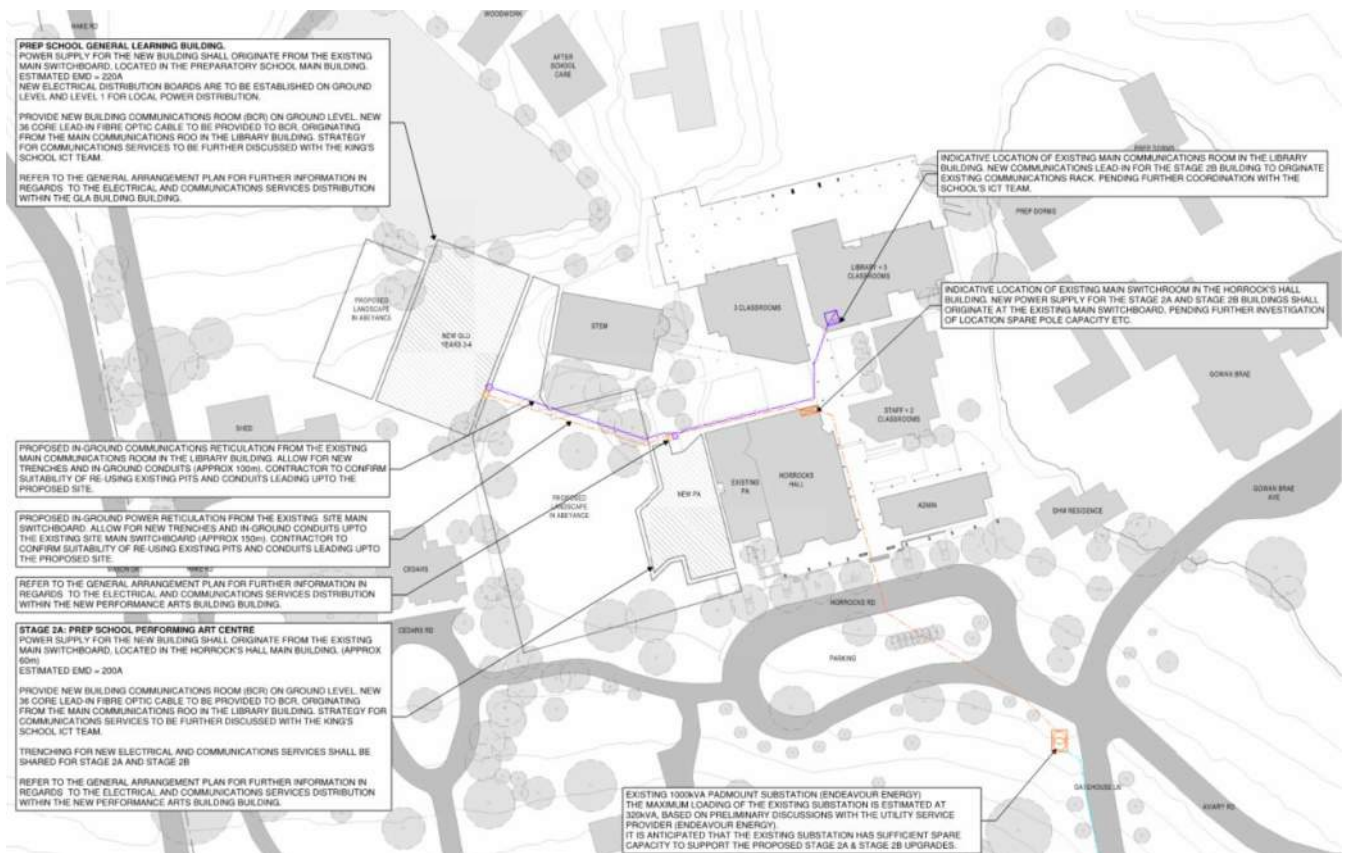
PREPARATORY SCHOOL ELECTRICAL INFRASTRUCTURE SITE PLAN
